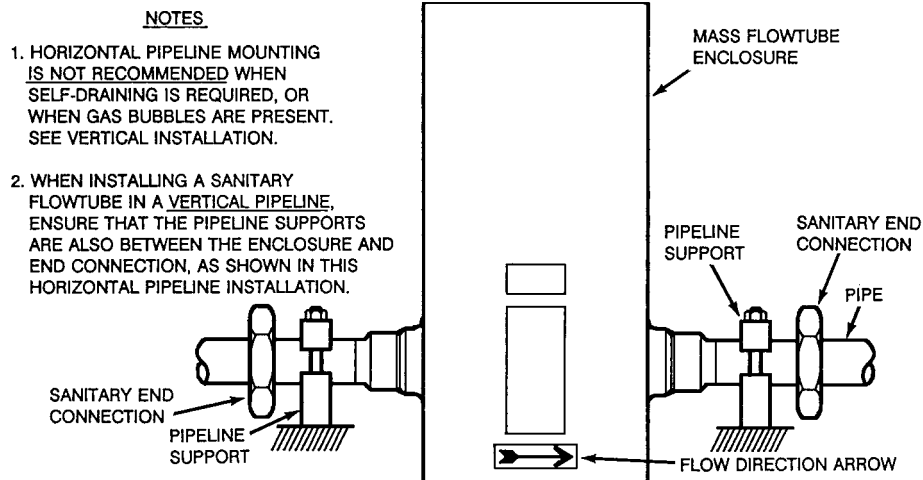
Flowtube Mounting with Threaded or Sanitary End Connections - Horizontal Pipeline
